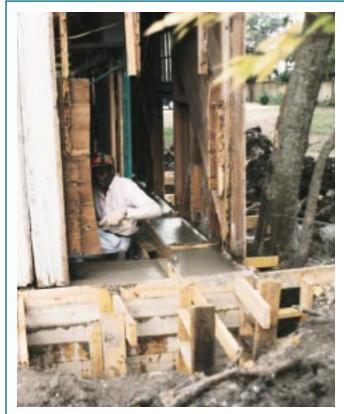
While the second story of the carriage house was suspended, the crew excavated, formed, and poured new footings (top), then repaired the wall framing and lowered the building onto new PT sills.
